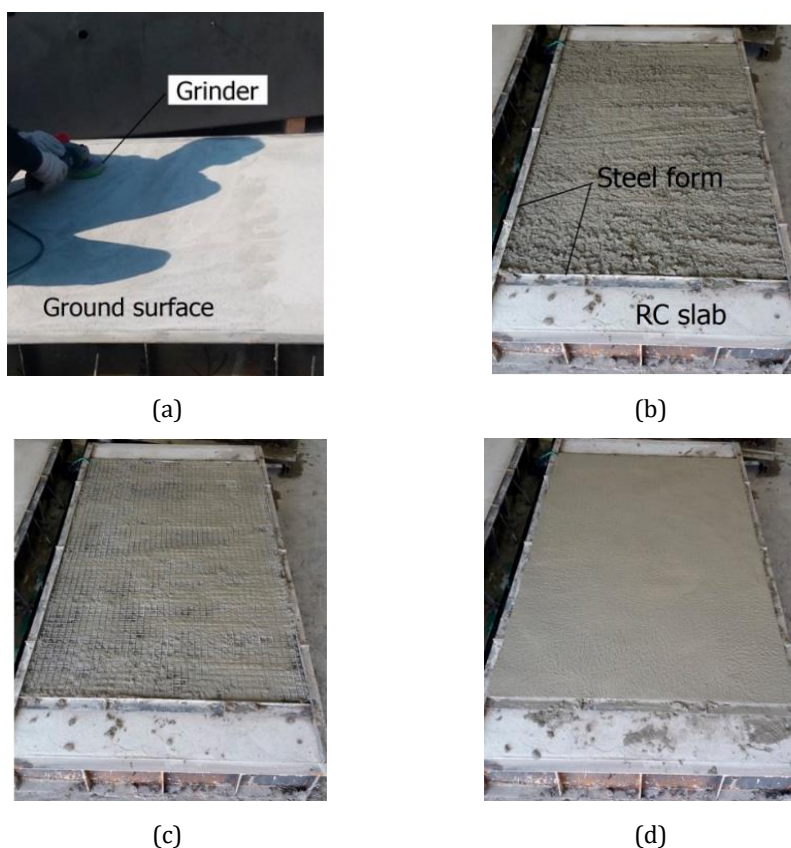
Strengthening of RC slabs (a) surface preparation (b) Placing 1st mortar (c) Placing Fabric reinforcement (d) Finishing with 2nd layer of mortar [88]
